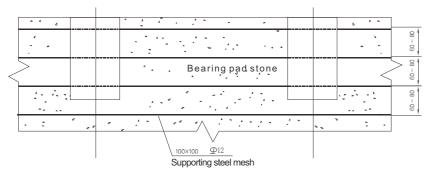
Elevation Sketch of Steel Mesh Reinforcement
